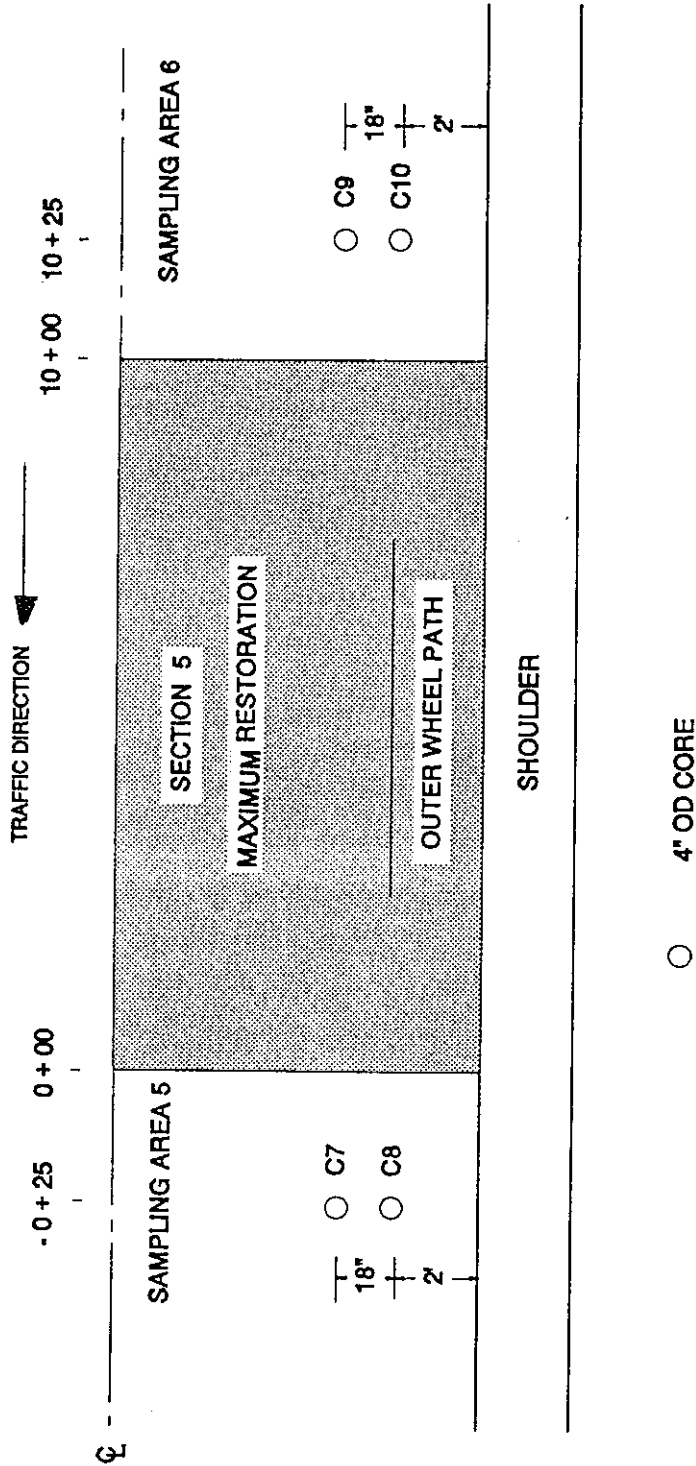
Example of "Pre-Construction" Sampling Plan for Test Section 5
